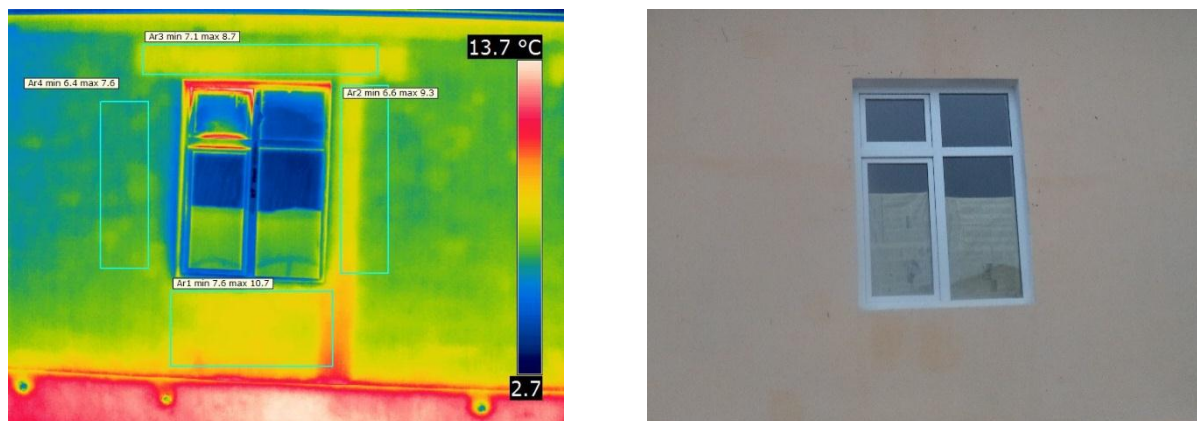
b) Thermographic image and photo of section of the front façade (far street side window) of the typical rural house
